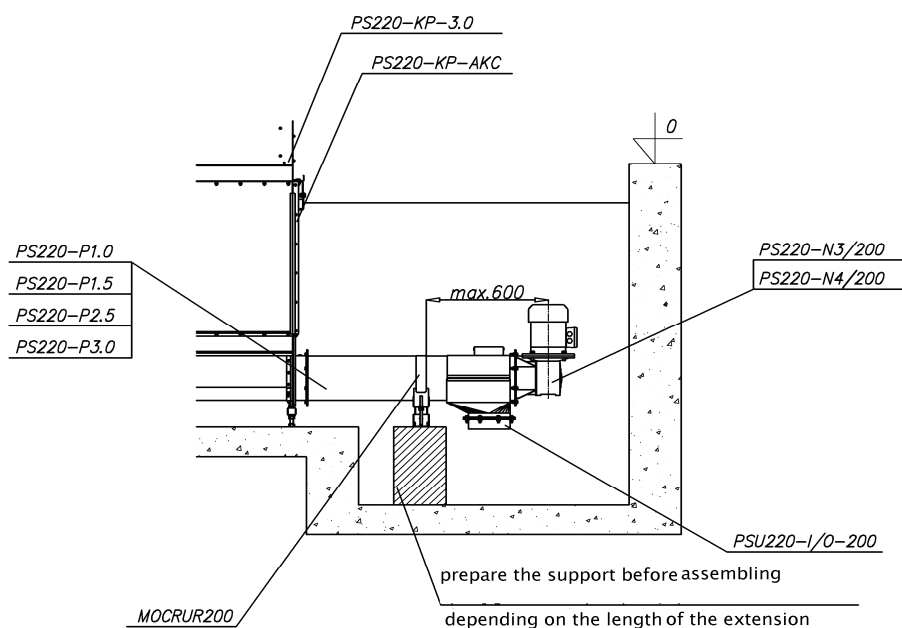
Manner of supporting the extensions of the PS220 system of the intake hopper – example.
